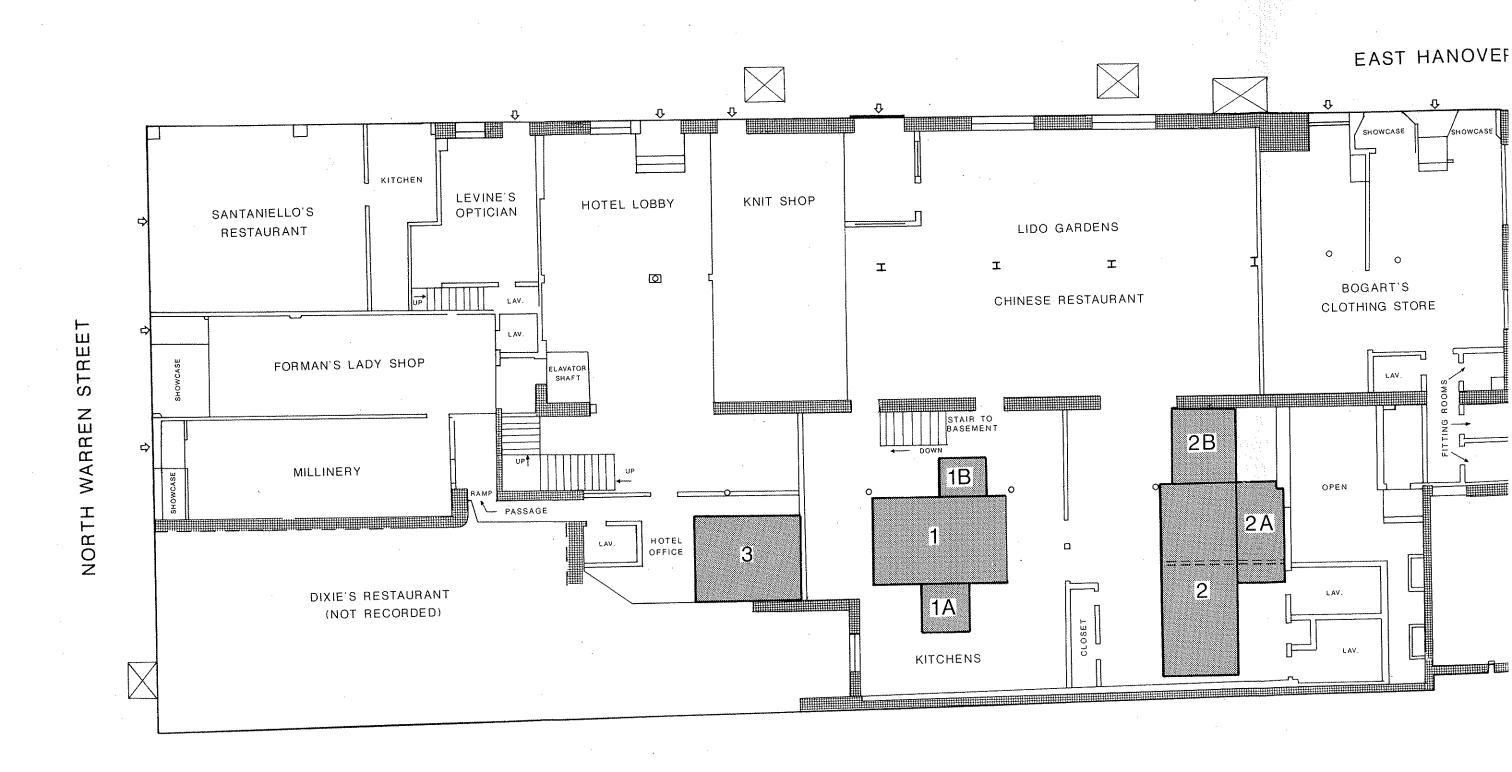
TRENTON HOUSE: FIRST FLOOR PLAN A
